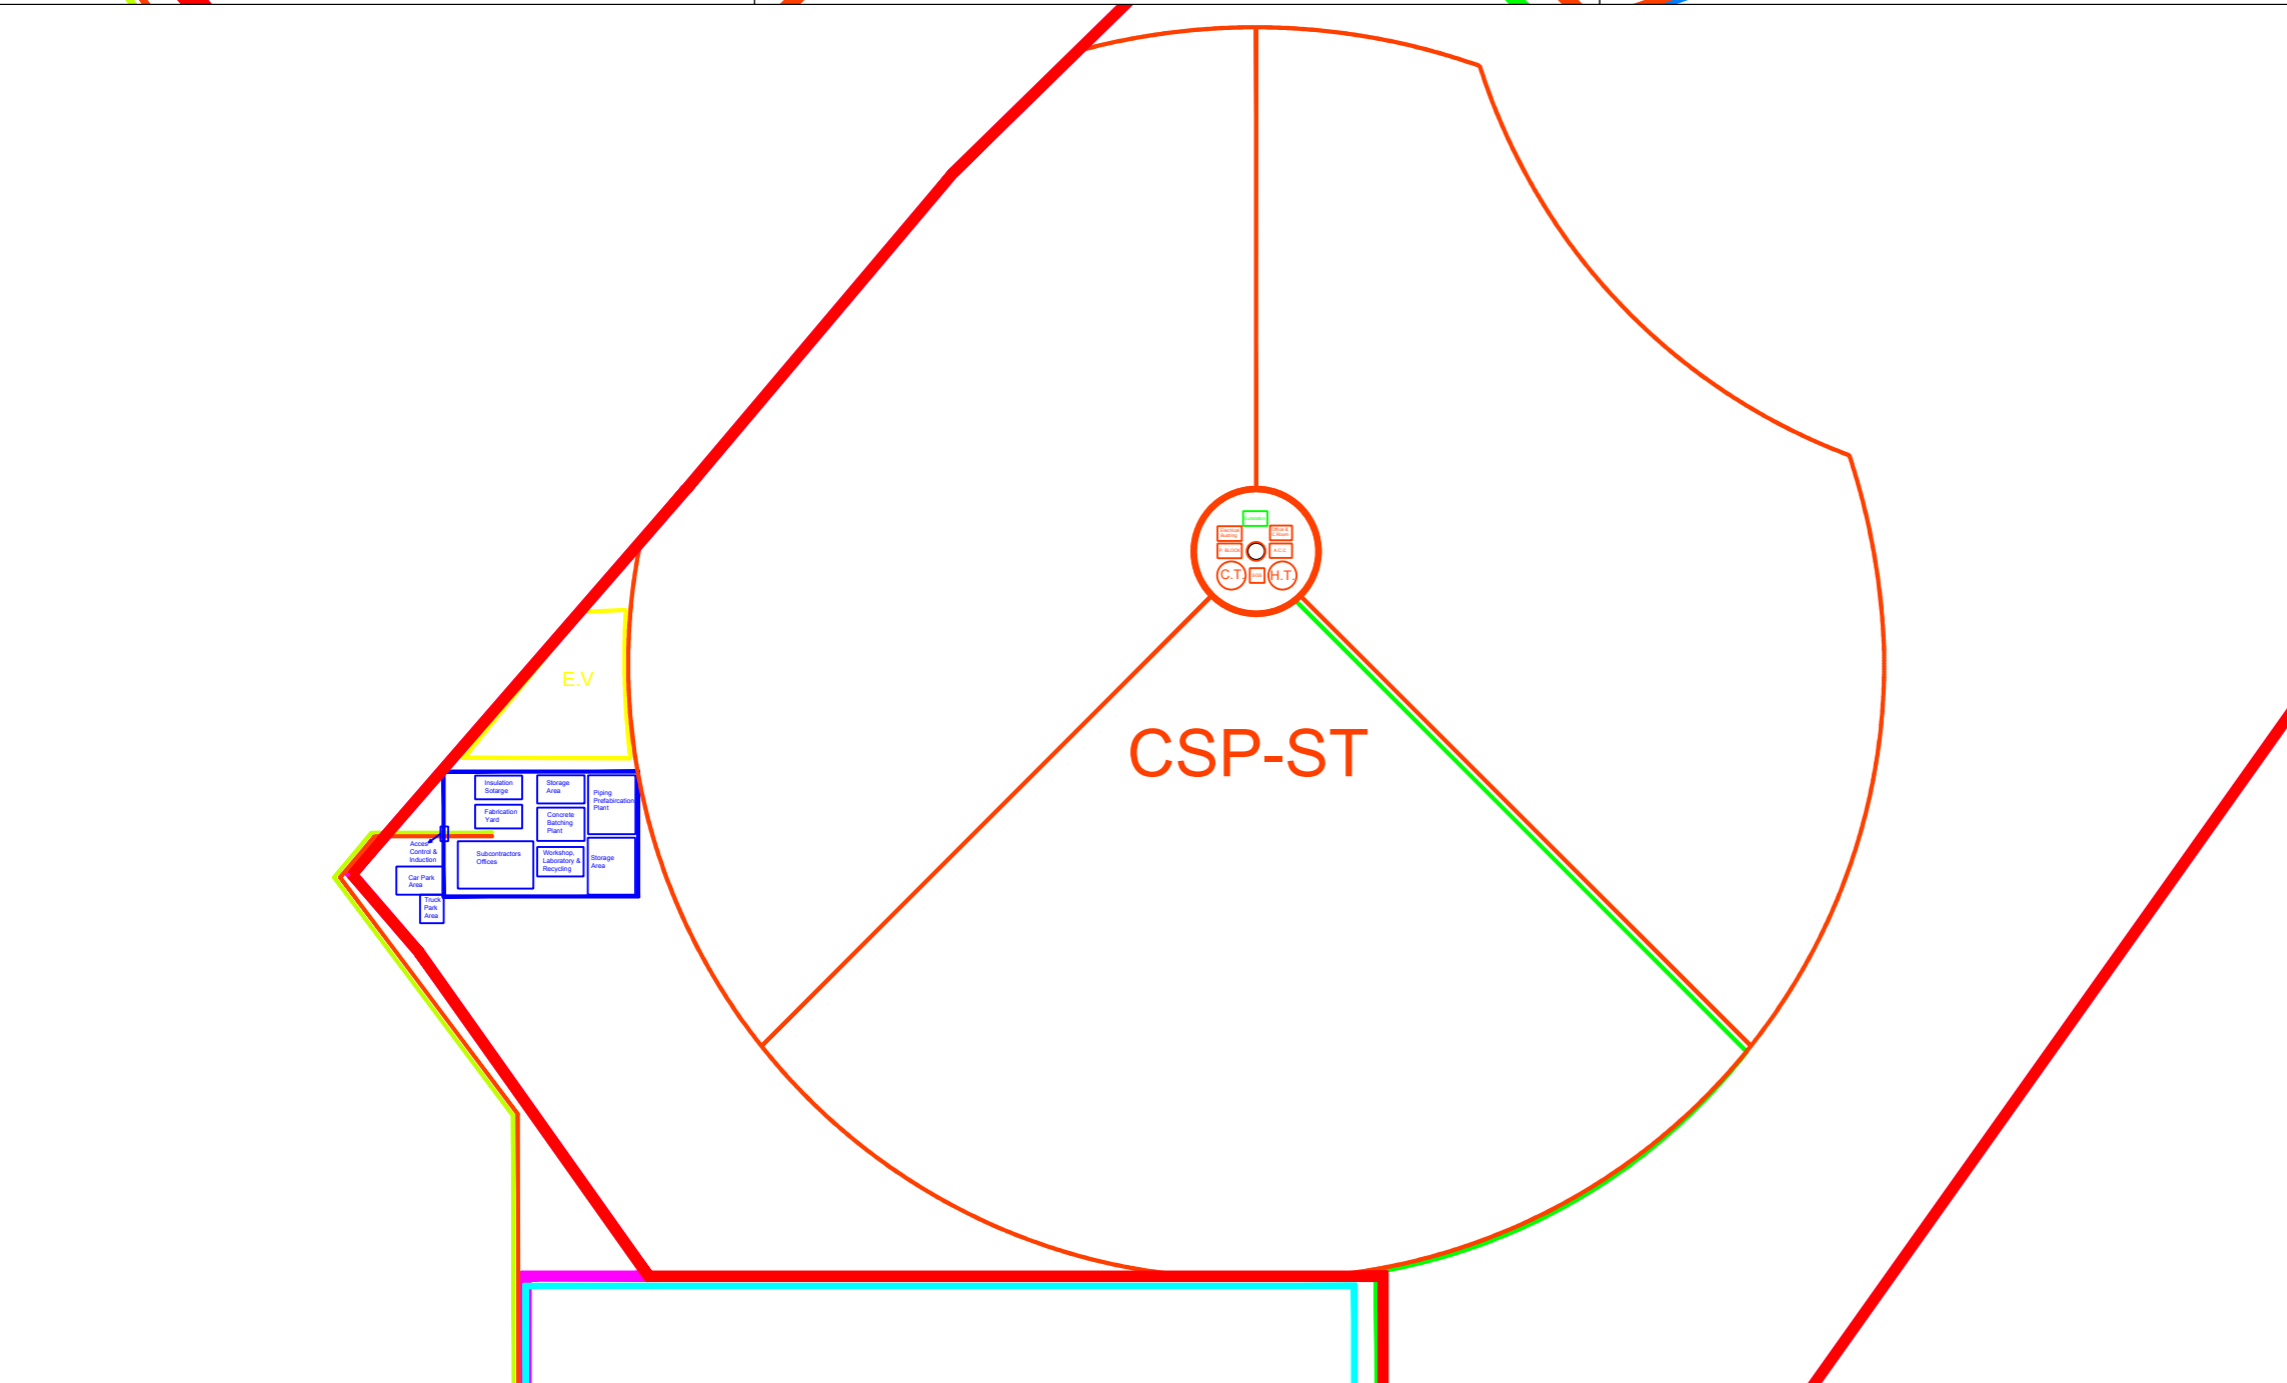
Proposed Layout of the 100 MW Concentrated Solar Power Tower Application (No. 2)
